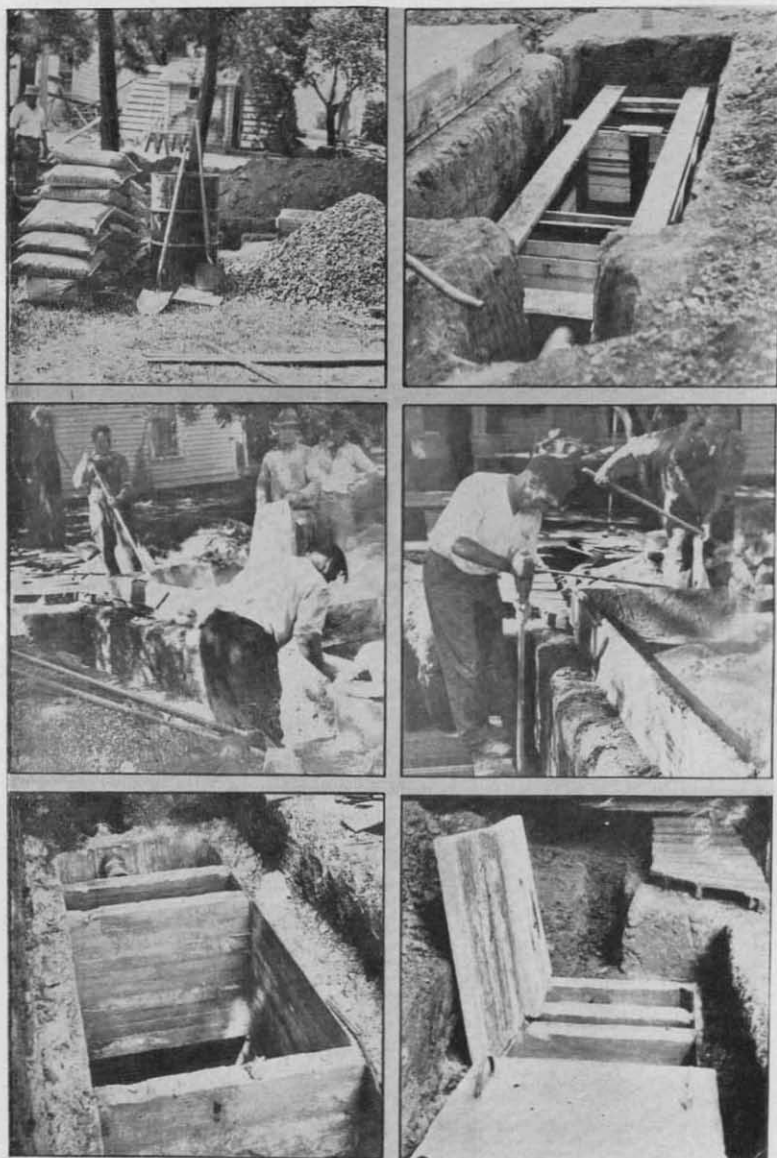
Steps in the construction of a double-chamber septic tank.
